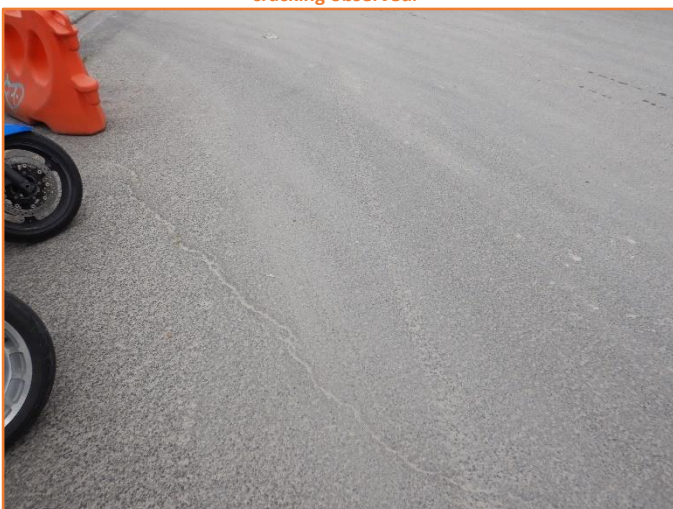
Reasonable - General condition of flexible pavement. Minor cracking observed.
